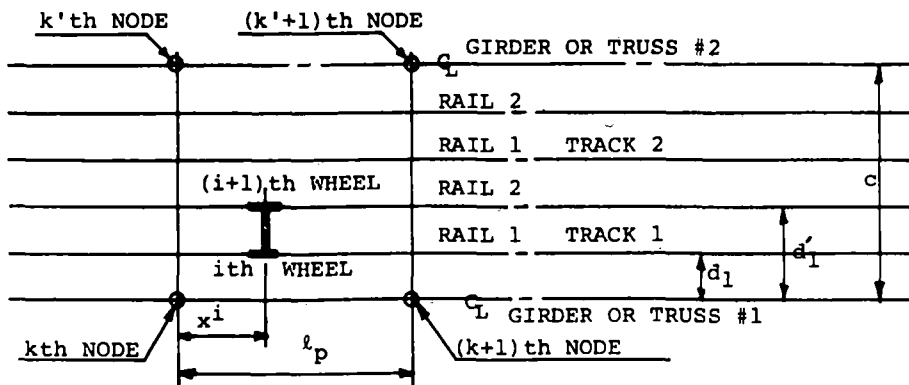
Plan View of the Position of a Wheel Load in a Typical Bridge Panel.
